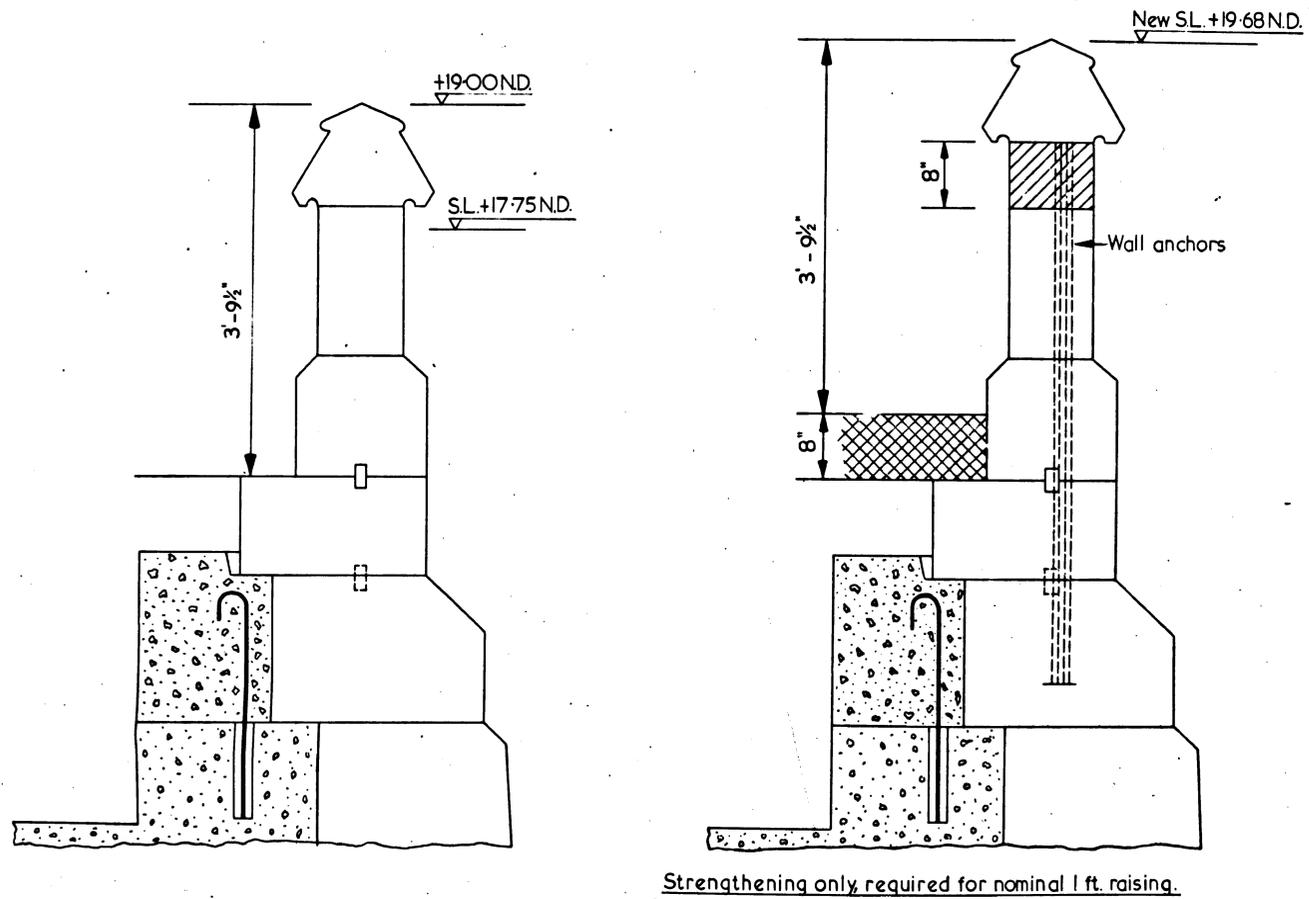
EMBANKMENT WALL RAISINGS VICTORIA TOWER GARDENS NORTH
